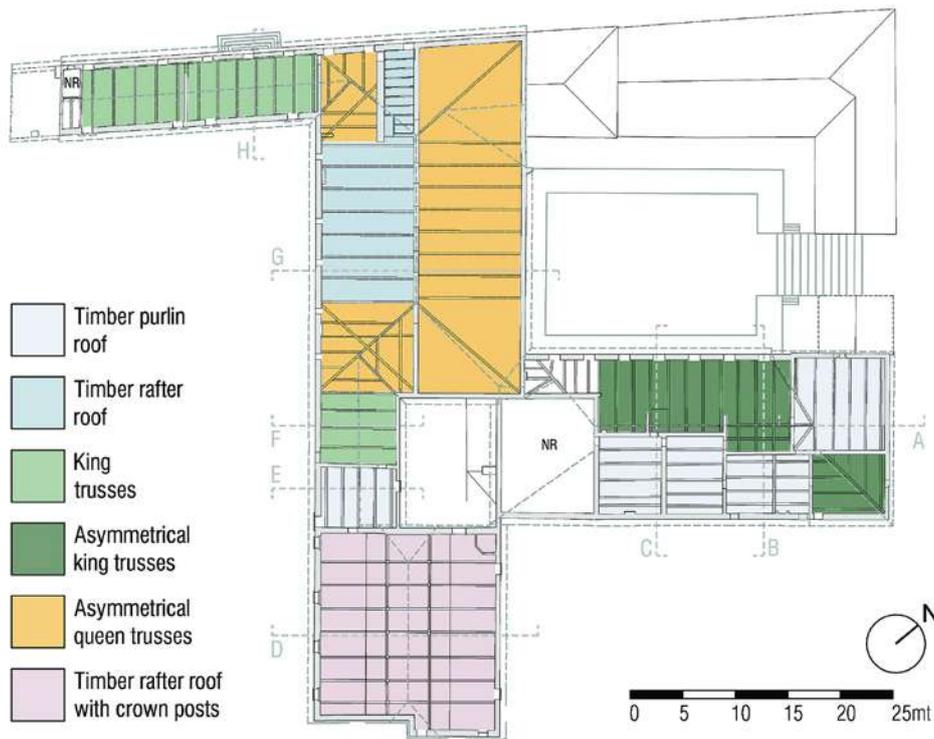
Site diagram of the timber roof with different types of timber structures.
